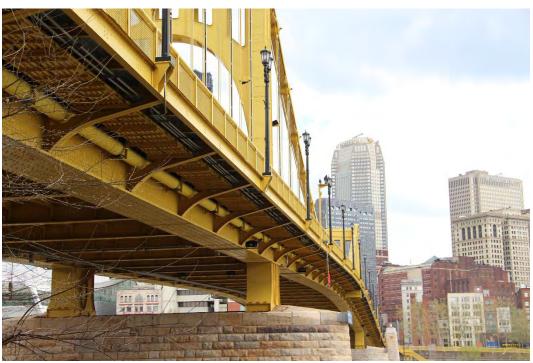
Rachel Carson Bridge (April 2024), overview of underside of west elevation of bridge, facing south from north end of bridge, showing stiffening girder and sidewalk brackets.
